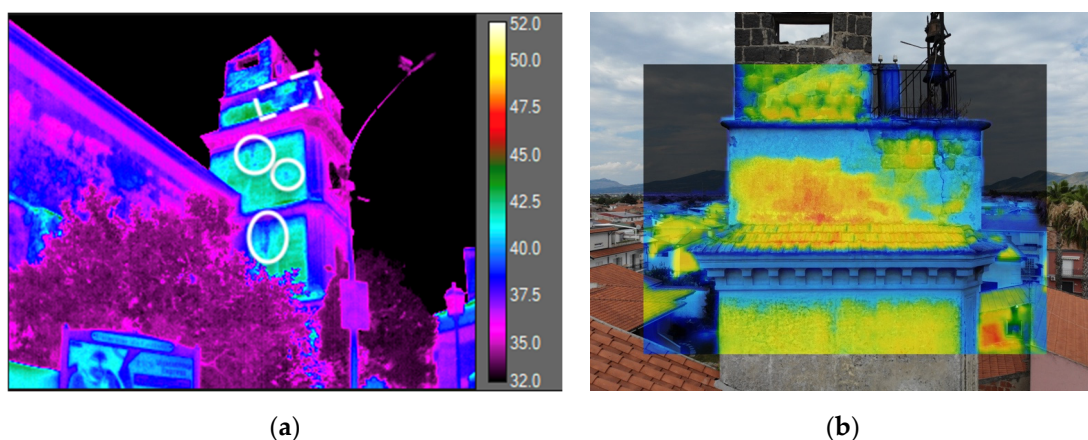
Cracking phenomenon observed on the west façade: inspection with thermal imager from ground (a) and with drone (b). Cracks are circled in white.
